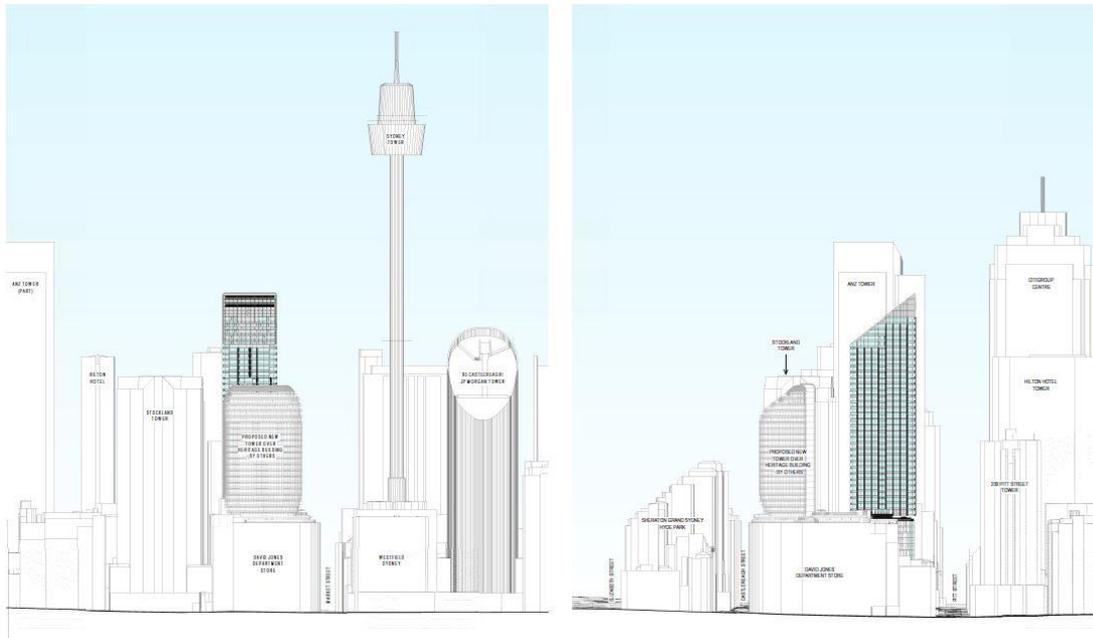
Streetscape context east (Castlereagh St) left, and north (Market St) elevation right
